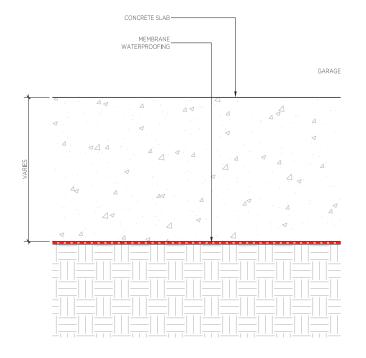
Passivhaus Proposal—Ground floor slab above unconditioned space
